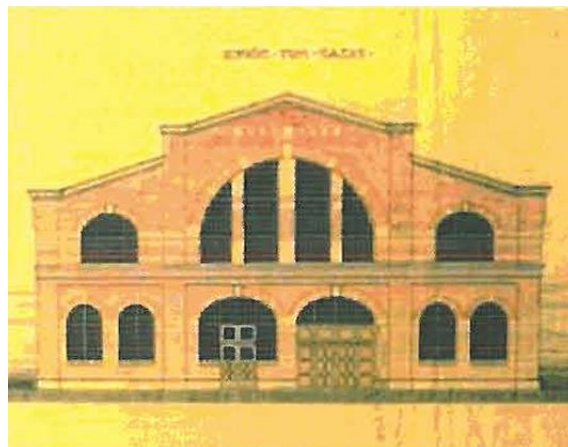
The original elevation layout of the south façade from 1911 (*Detaljplan För Fastigheten Hamnen 2 1 : 149 (Varvshallarna) i Hamnen i Malmö*, 2017)
